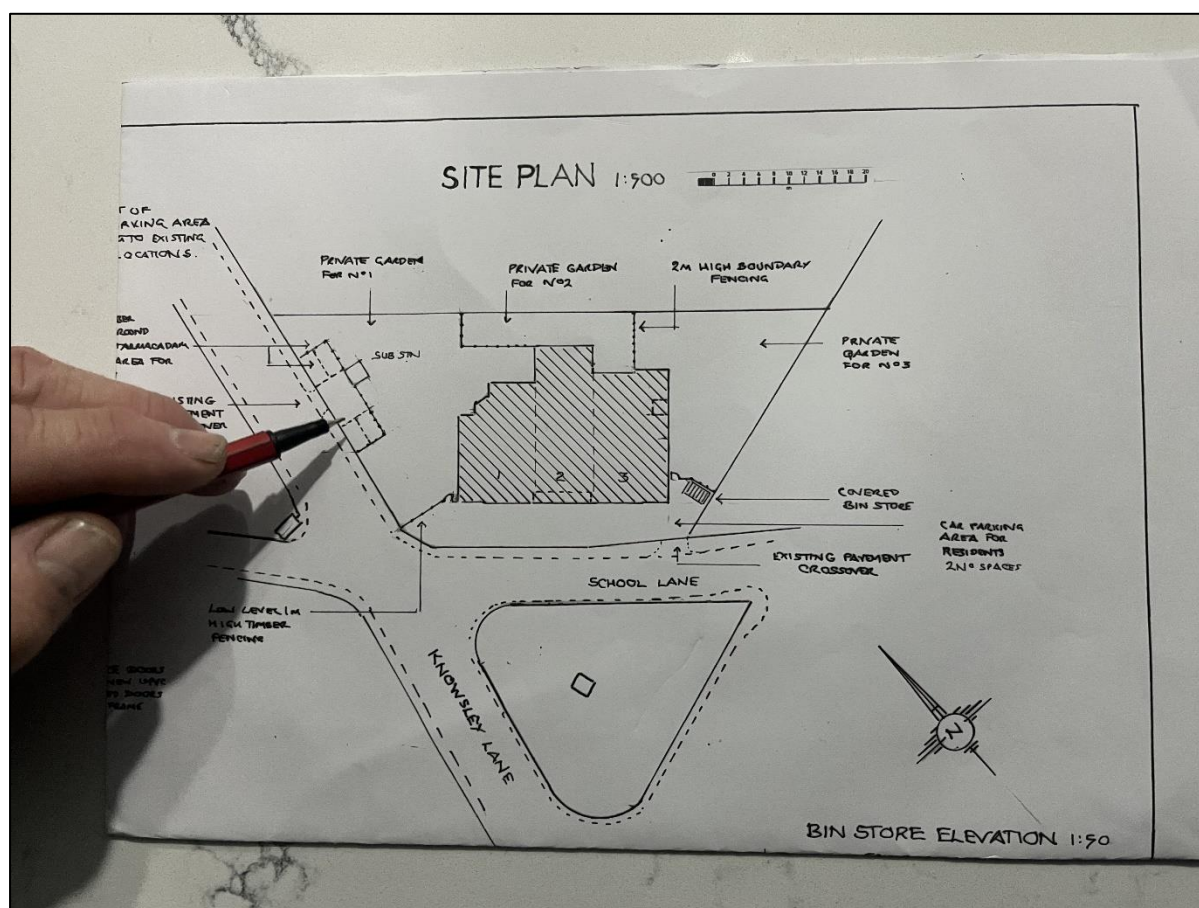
Proposed site plan © Mr. B. Maguire
